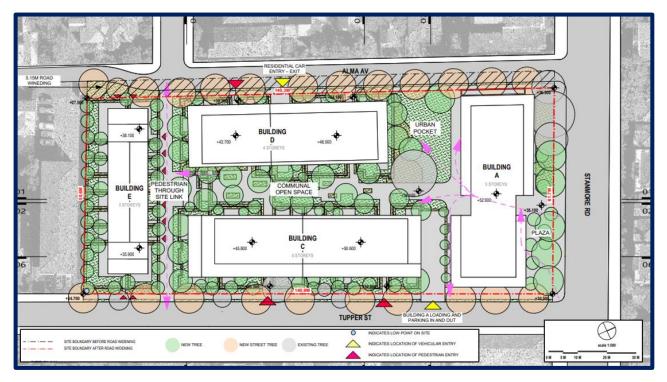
Scaled site layout plan (Source: the planning proposal)
